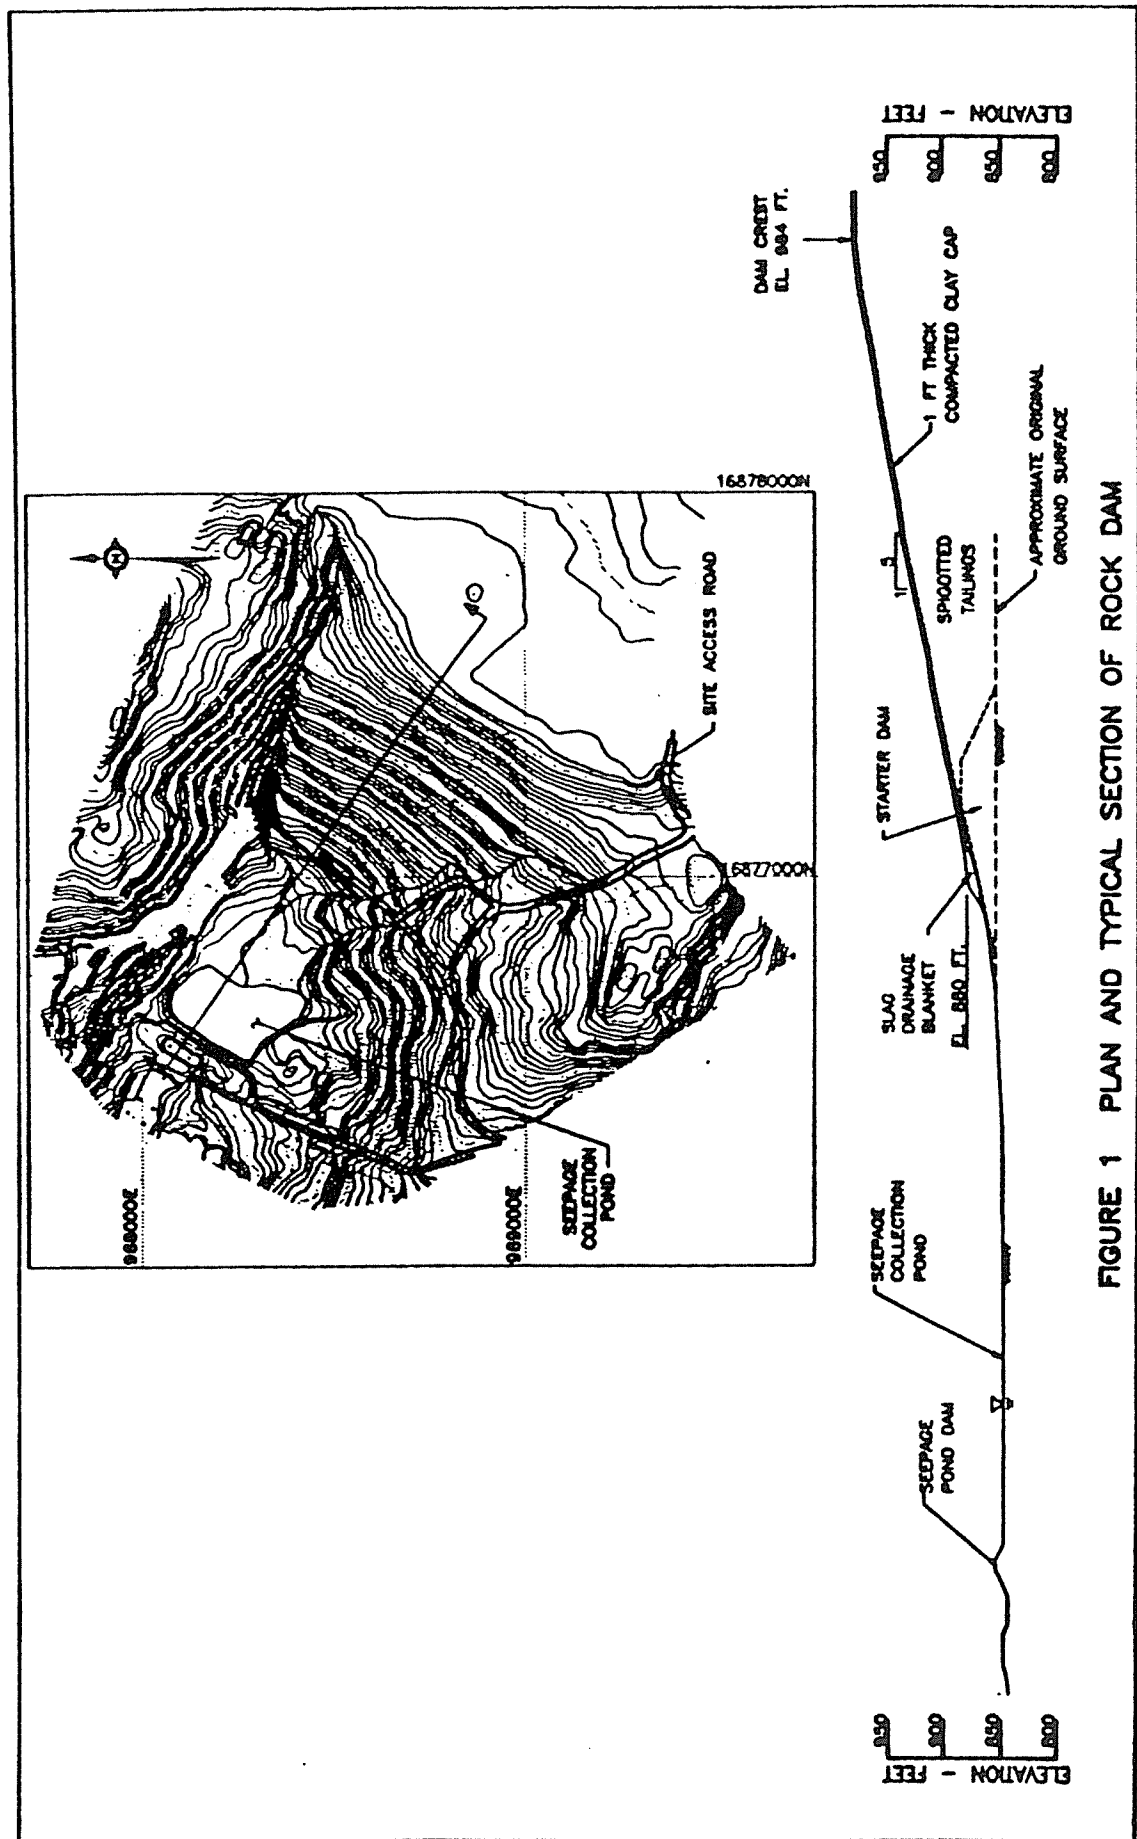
PLAN AND TYPICAL SECTION OF ROCK DAM
